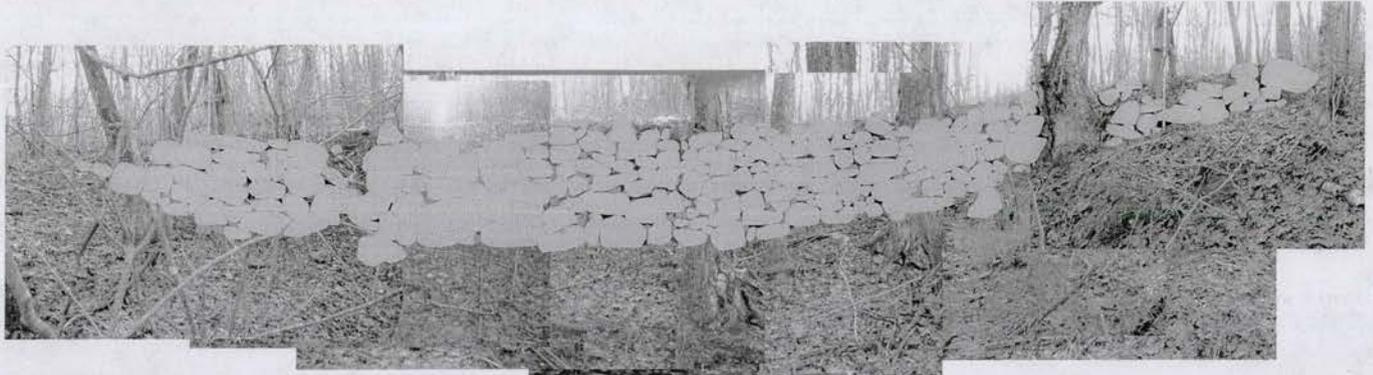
25-12-1-2005 London Bridge W wall overview View NE
